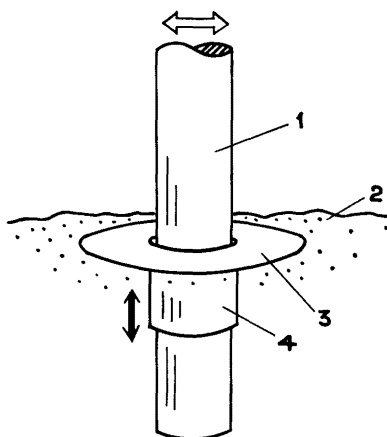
Cylinder protected with a slider ring. Open arrow indicates the direction of water oscillation, and solid arrow the direction of movement of the slider ring.
